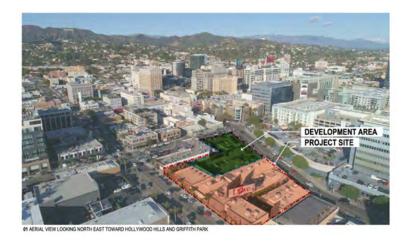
Aerial View of Project Site Looking Northeast Toward Hollywood Hills and Griffith Park
